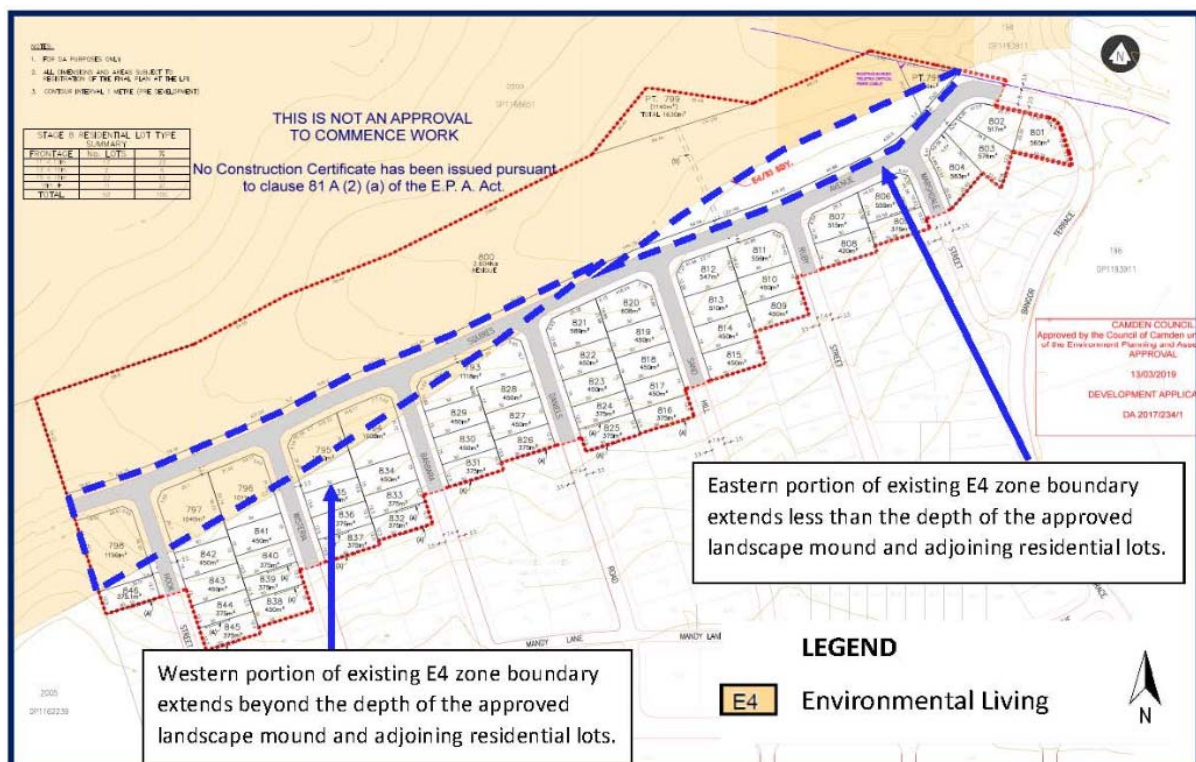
Approve Subdivision Plan for Stage 8 Arcadian Hills and Current E4 Zoning Overlay
